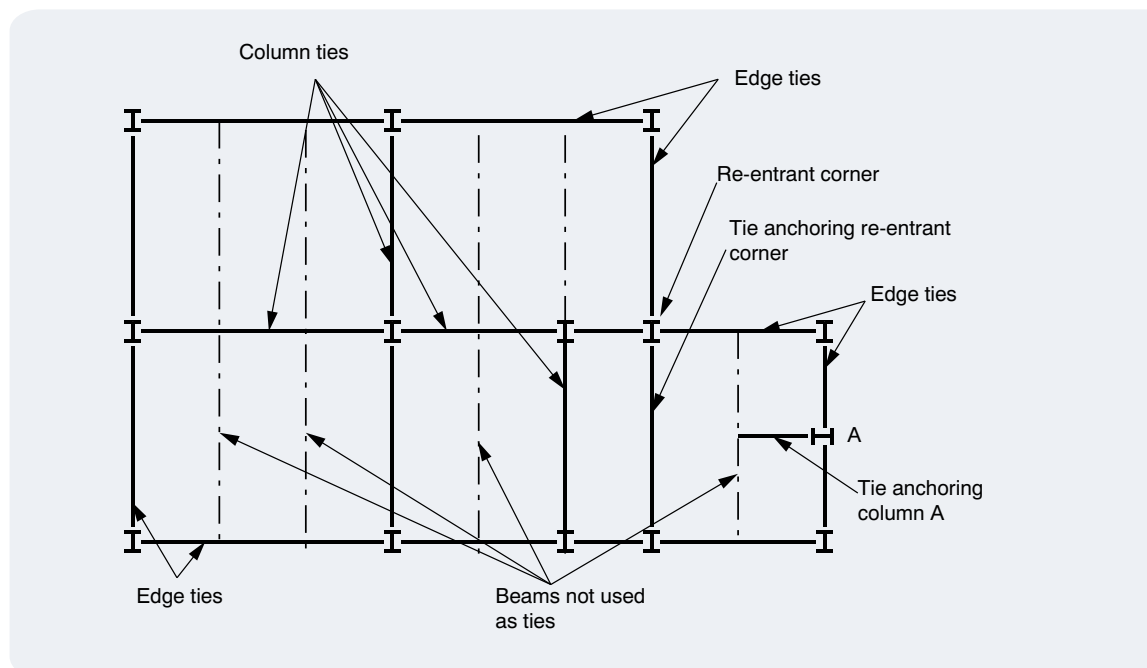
Typical horizontal tie arrangement for a steel frame.
